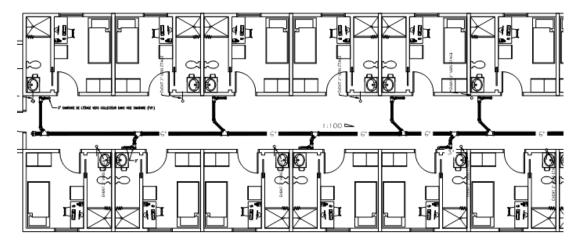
Windfall dormitory layout - typical room with private bathroom
